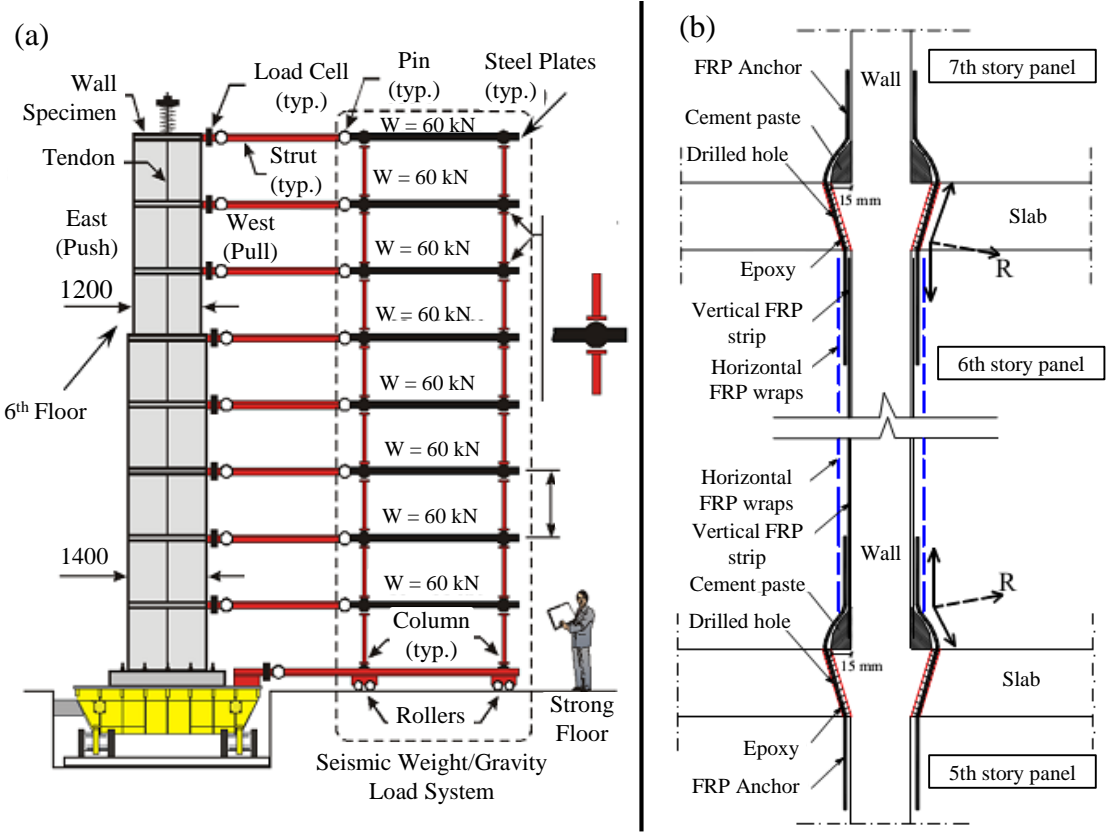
Testing specimen at half-scale (a) and Detail of Tyfo SCH Anchorage for Wall 2 (b)
